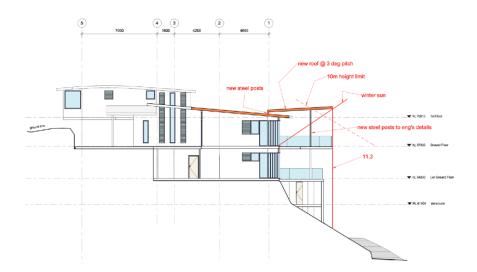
Elevation showing extent of height breach at the northern leading edge of the proposed new roof, and the steep fall of the landform below. Source: Peter Downes Designs
